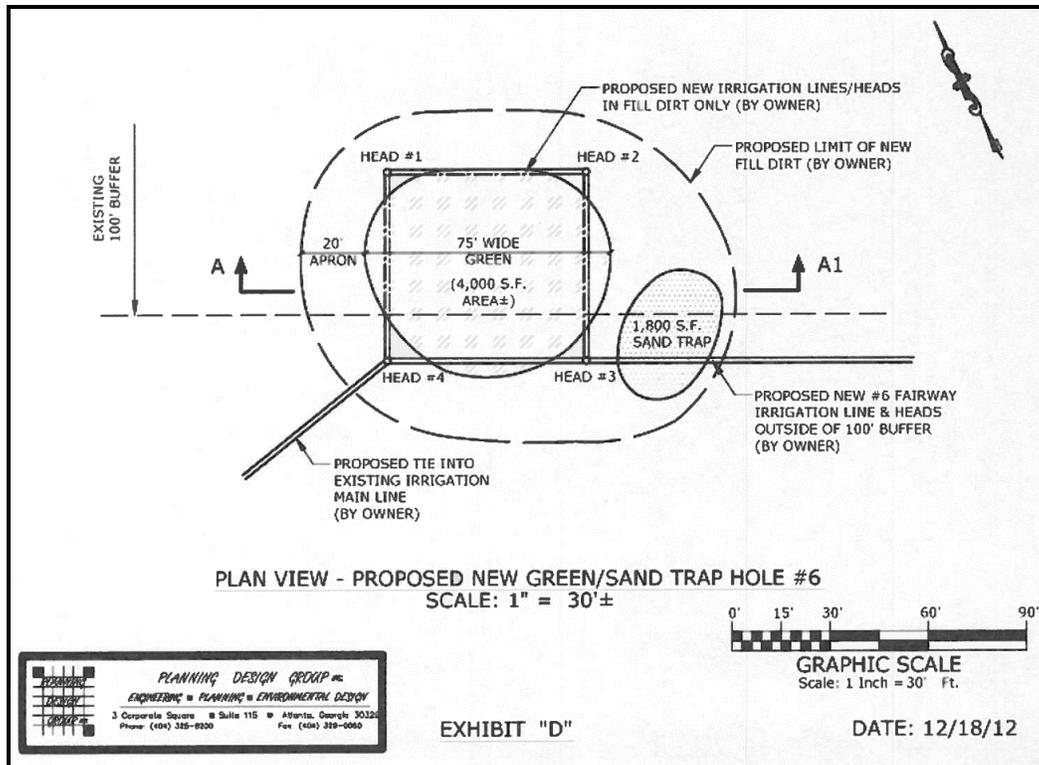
Proposed Improvements in the Area of 9GO59. Plan View Detail of Hole 6 Cost-to-Cure Construction Plans.
